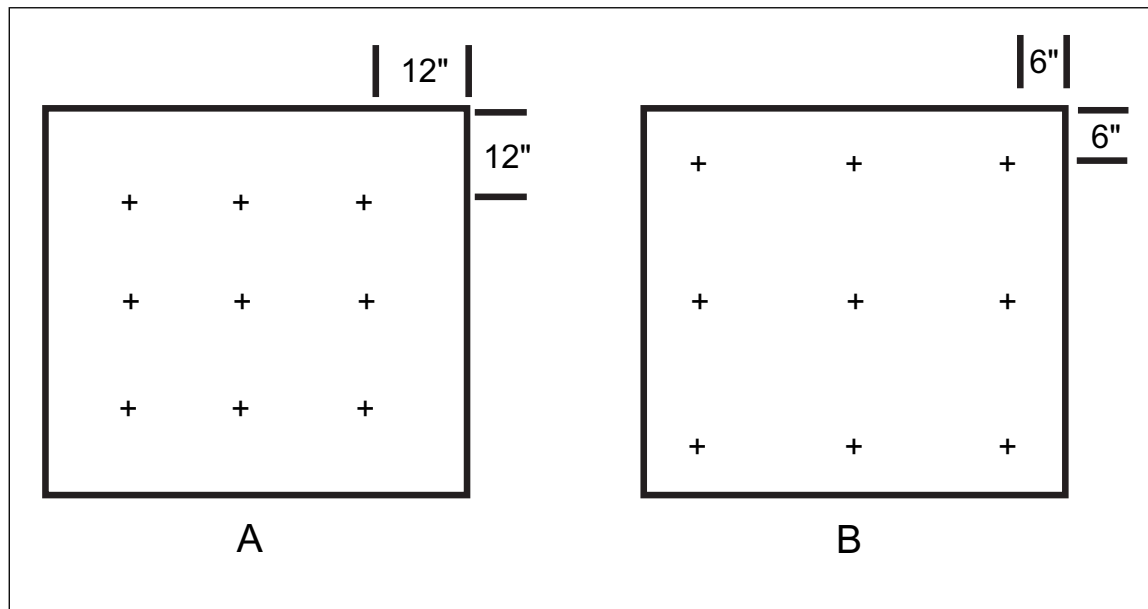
/6b. 4 × 4 ft (1.2 × 1.2 m) insulation boards secured with nine fasteners per board.
